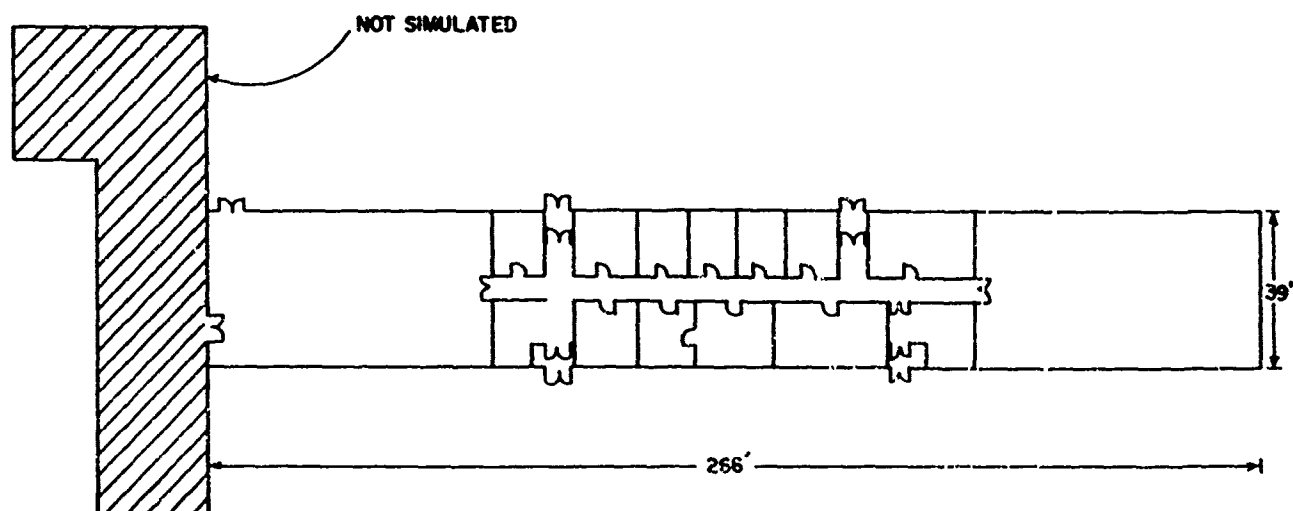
Line drawing of the first floor of the Type 64 barracks.
